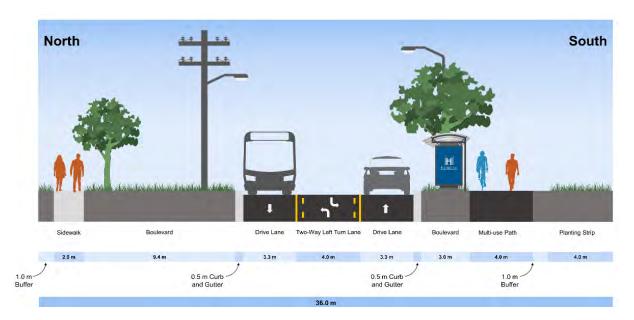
Barton Street - Lewis Road to Fifty Road Interim Configuration
